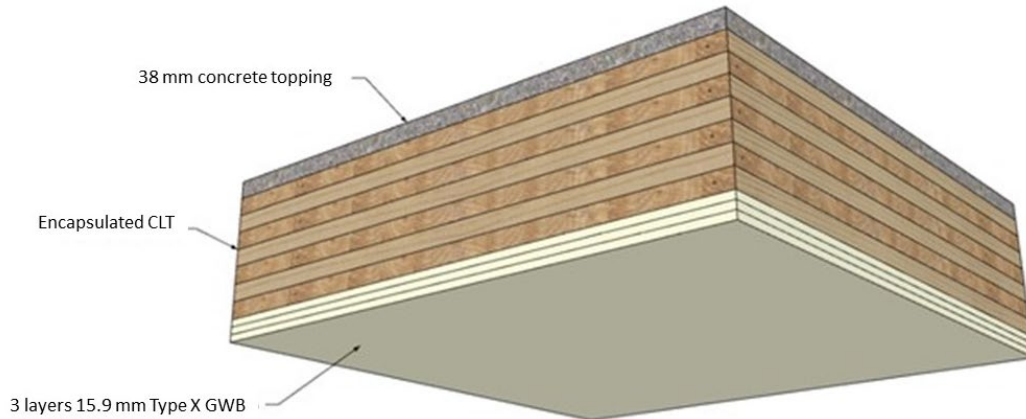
Complete encapsulation of CLT (2 hr of fire protection using three layers of 15.9-mm thick Type X gypsum board).
